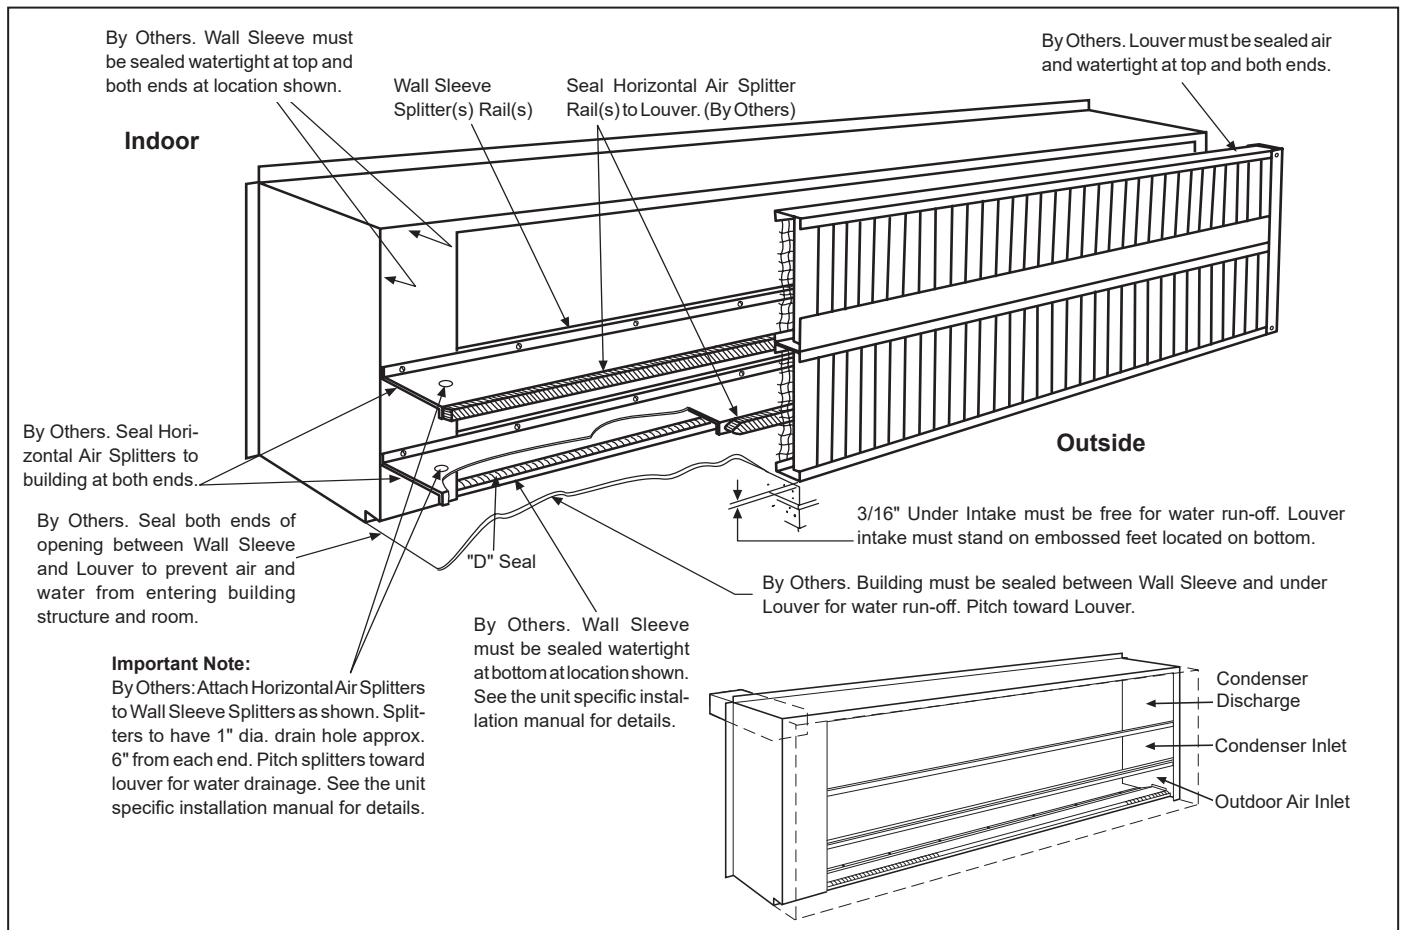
Sealing Full Projection Wall Sleeve and Horizontal Air Splitters
